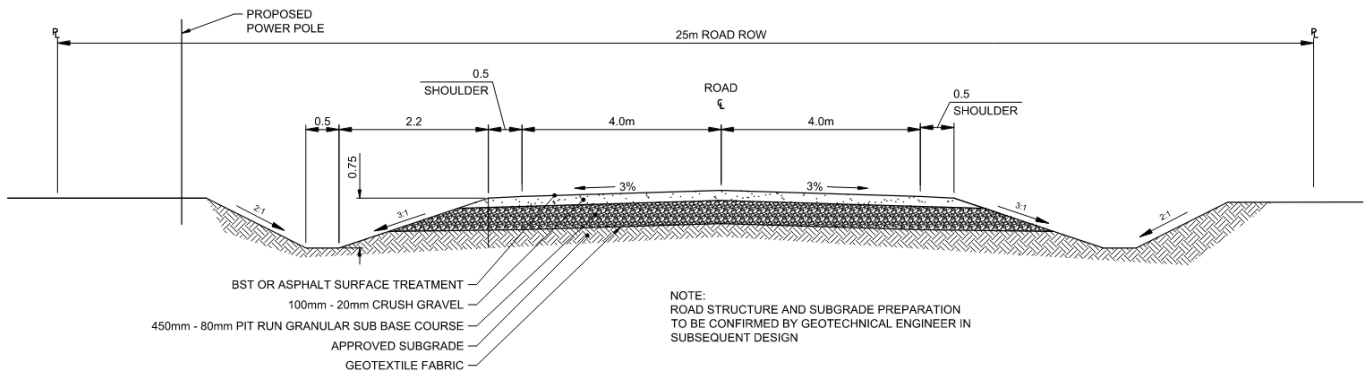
Proposed 9.0m Rural Industrial Local Street Section with Flat Bottom Ditch
